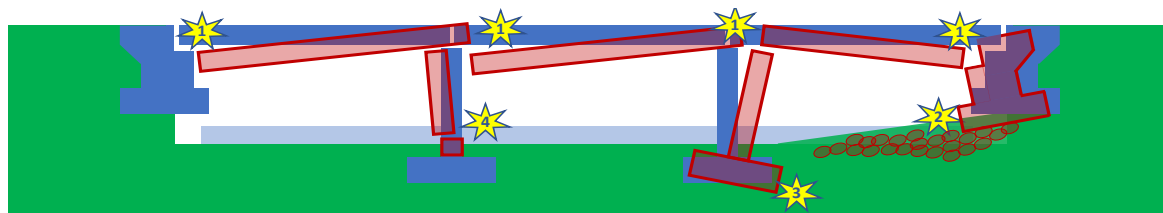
Most common earthquake types of bridge sudden collapses (any or all can occur): 1—bearing slippage; 2—abutment foundation soil landslide; 3—column turnover; 4—column shear failure [10]
